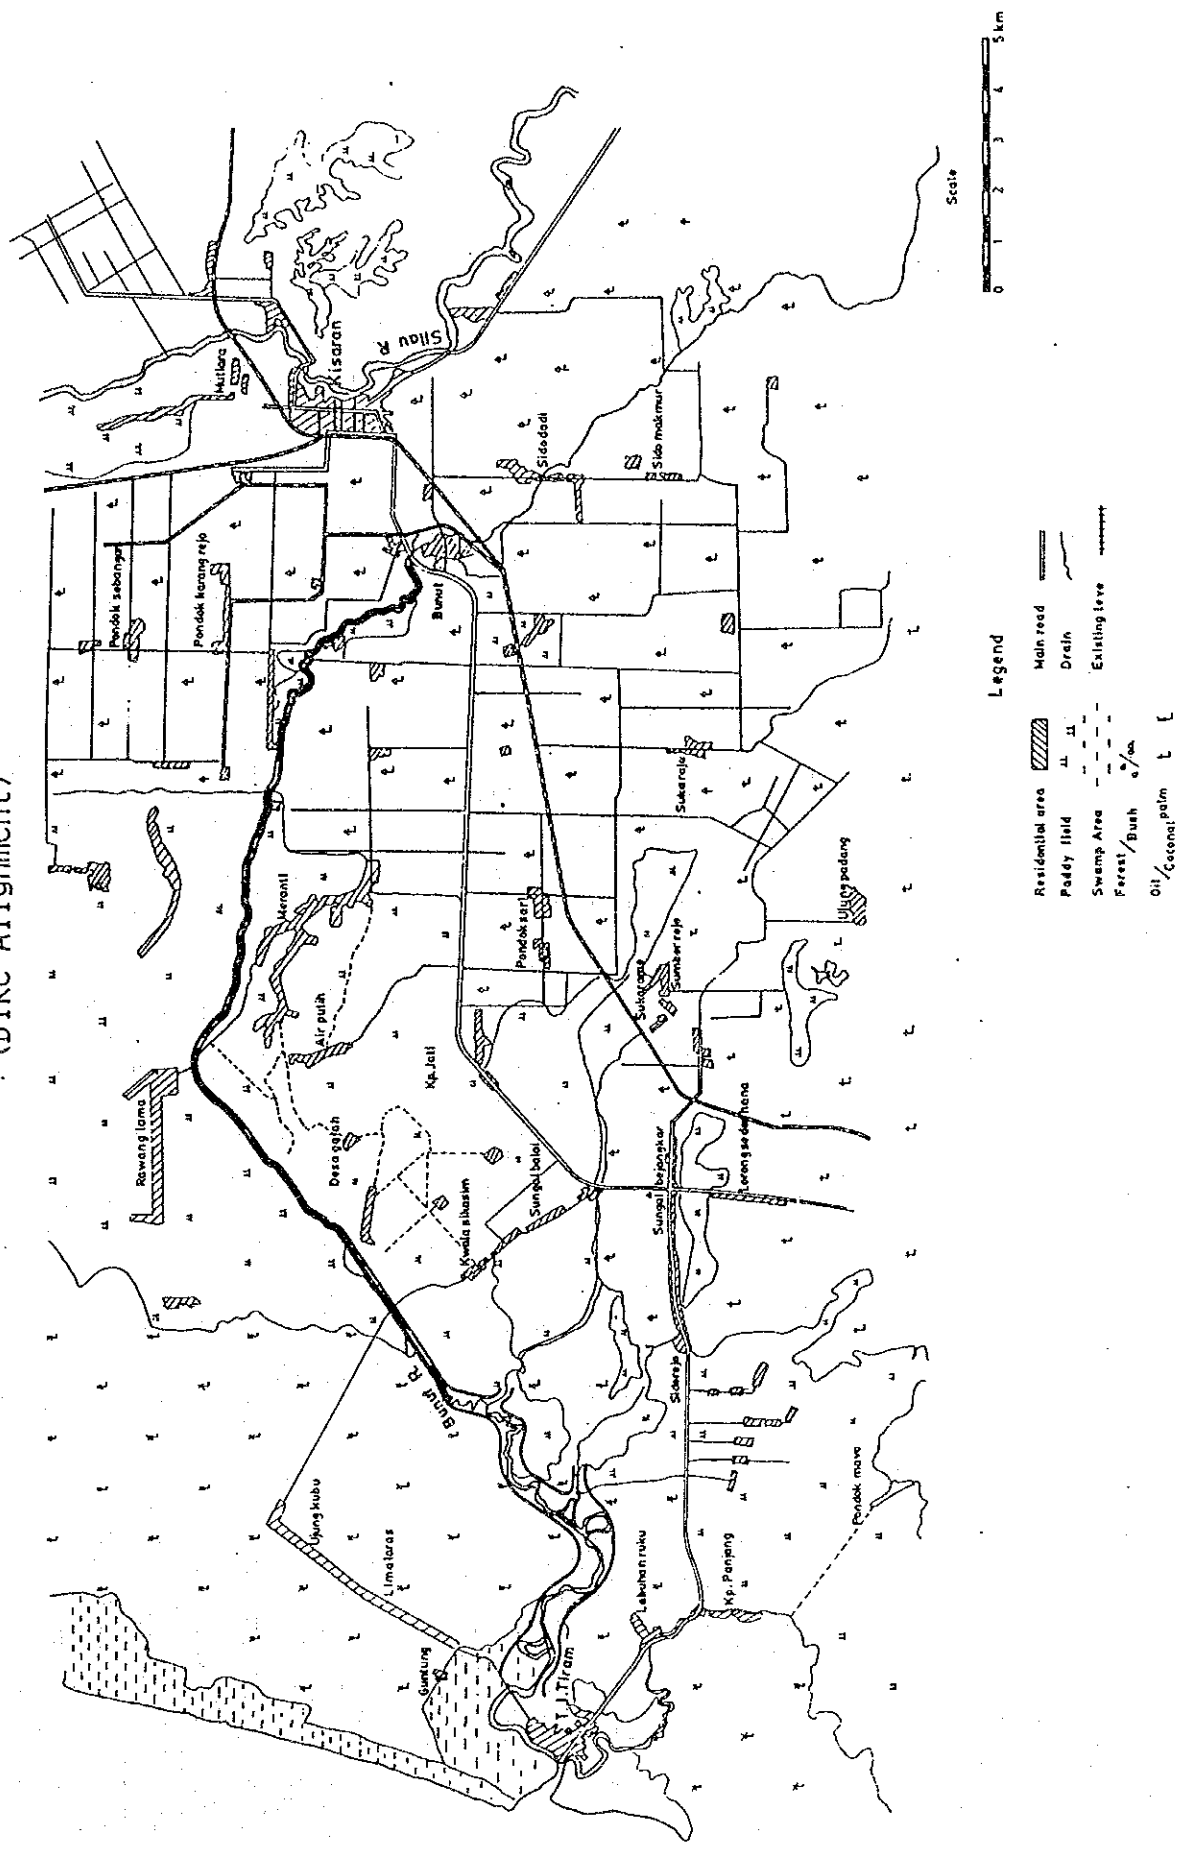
Proposed Long-Term Plan of Bunut River (2/3)
